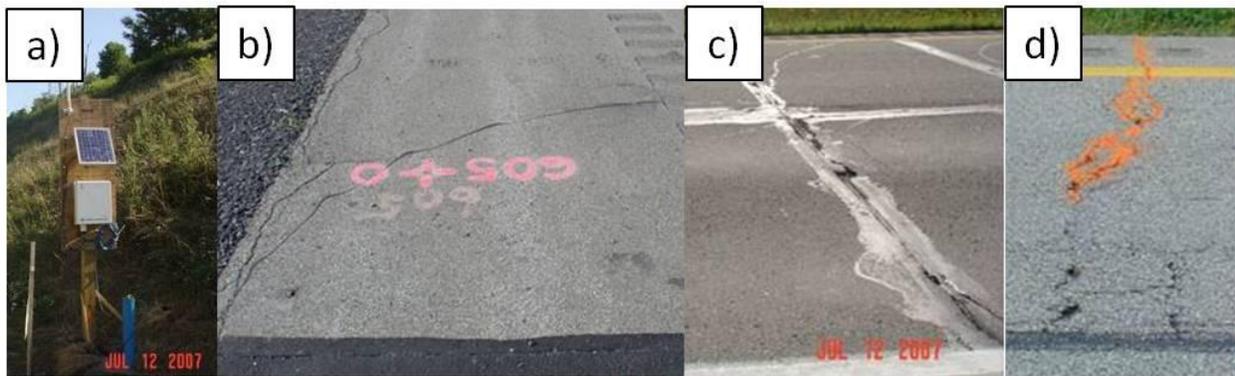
Panel B5 photographs showing (a) data acquisition equipment, (b) corner breaks, (c) transverse joints, and (d) transverse cracks (Photographs from PA DEP files).
